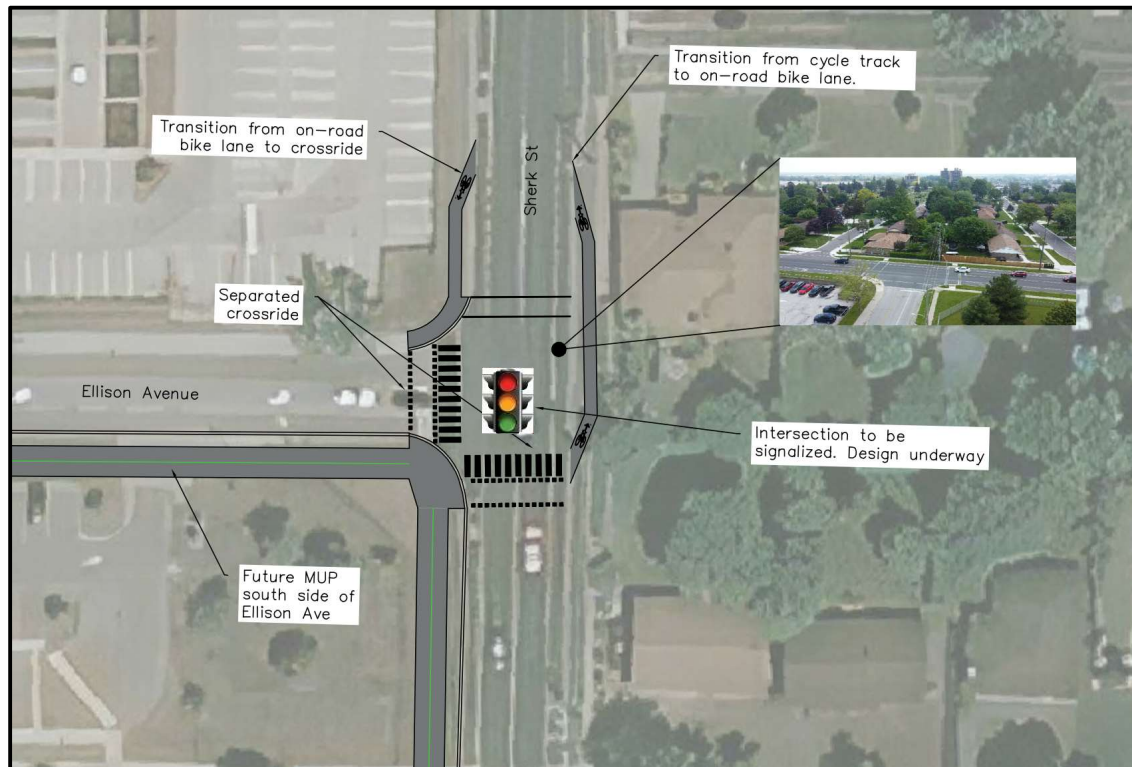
Sherk Street and Ellison Avenue Improvements
